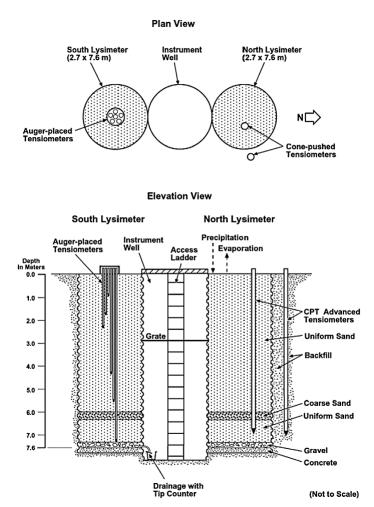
Plan View and Cross-Section View of 300 North Lysimeter Facility (after Fayer and Keller 2007)
